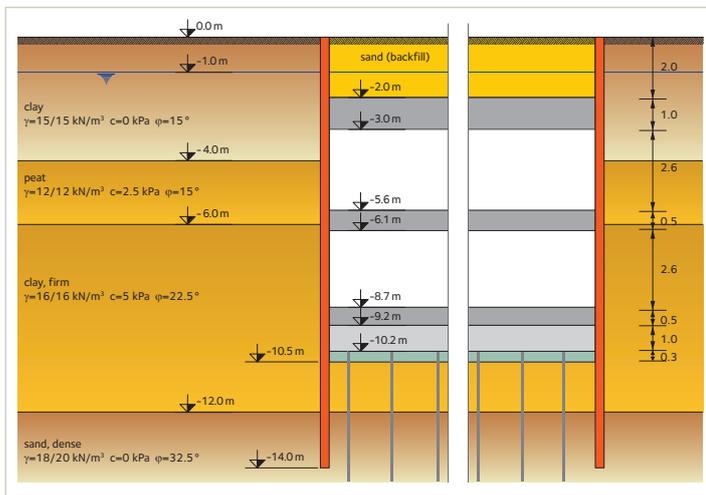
Cross section of the two-level underground car park - steel sheet pile solution (design by Witteveen & Bos).
